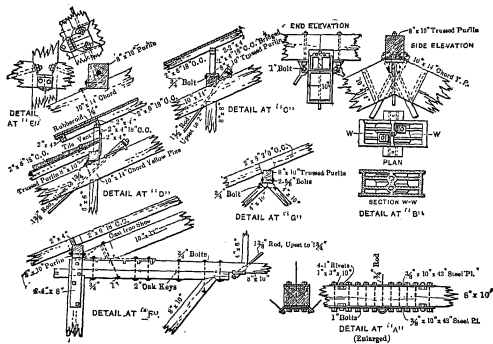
Details of Truss Framing in Forestry Building,
